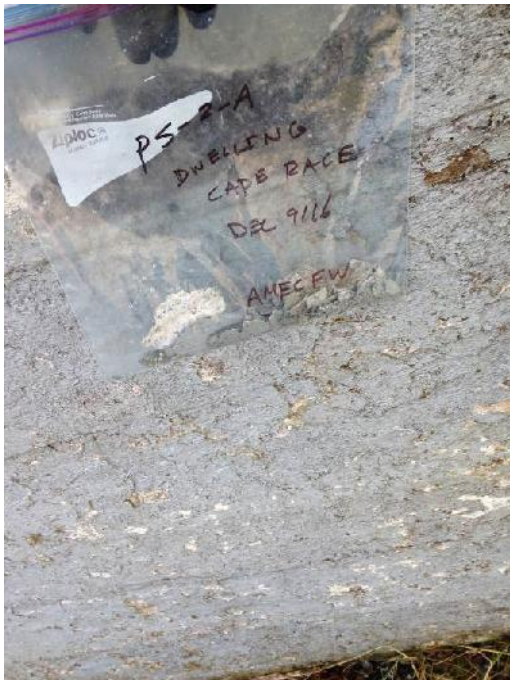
View of location of paint sample PS-2-A (exterior foundation wall).
